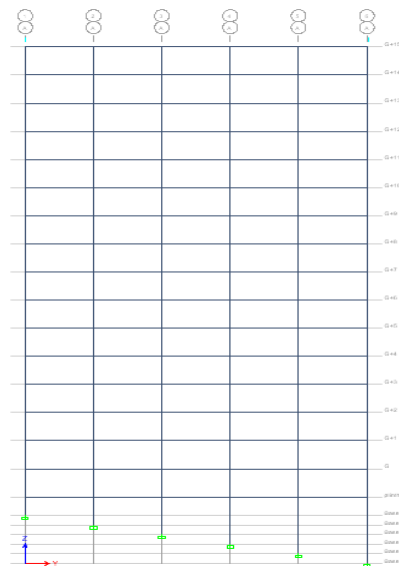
elevation of structure-2 resting on 100 ground slope
